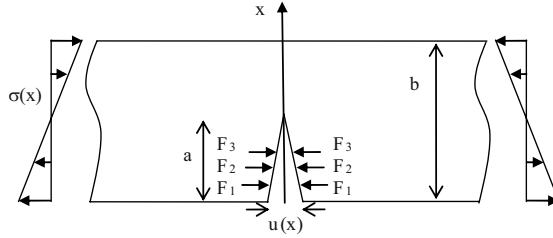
Reinforced concrete beam under flexure. Rebars are bridging the crack with forces  $F_i$ .
